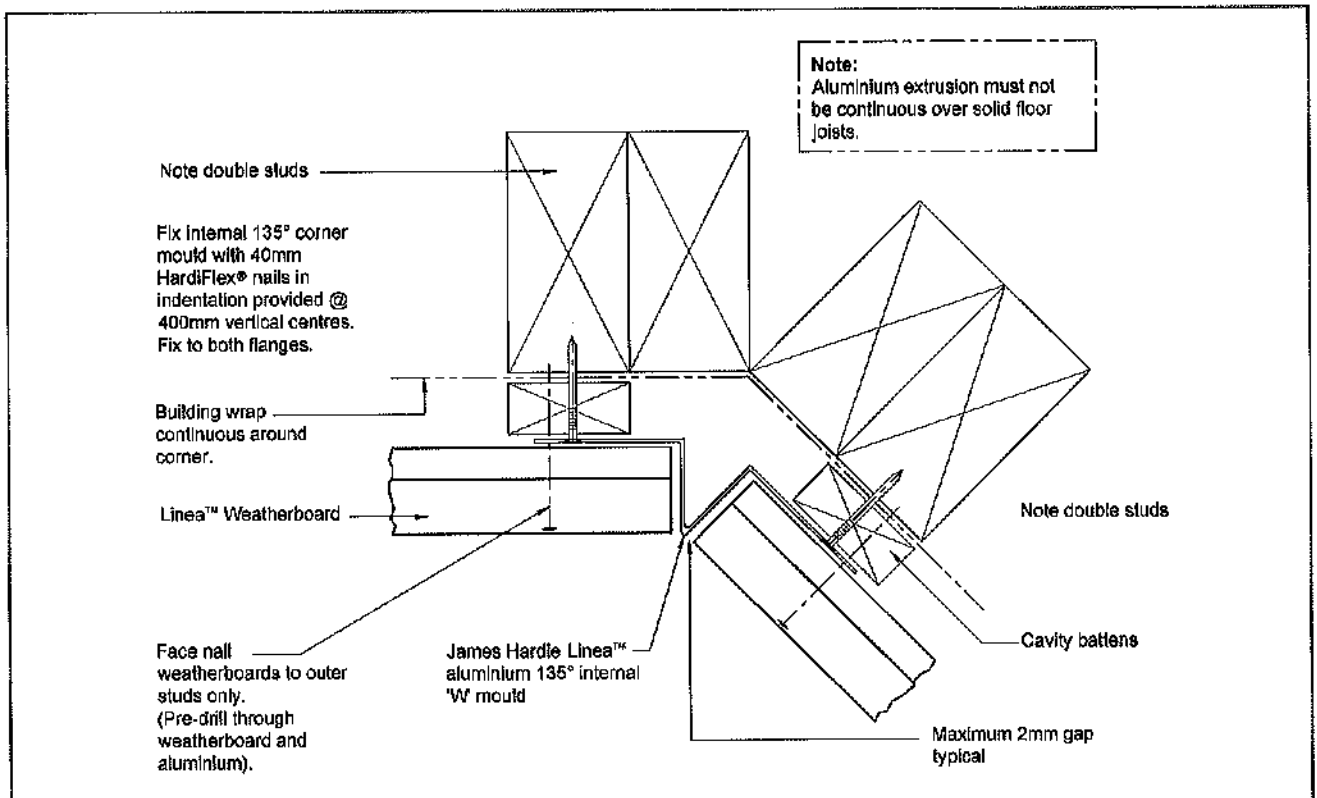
CAVITY INTERNAL 135° ALUMINIUM 'W' MOULD CORNER
